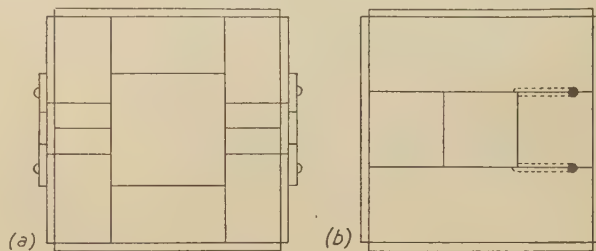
Plans for (a) Furnace Side-Walls and (b) Roof.
